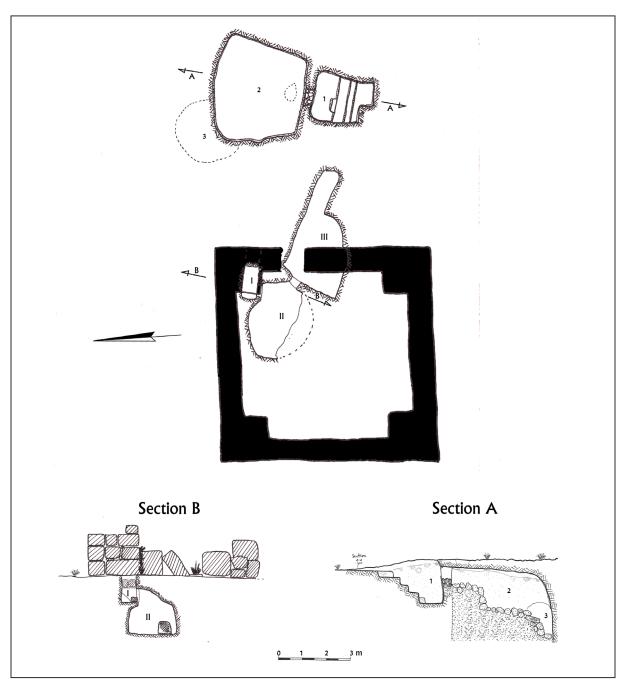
Plan and cross-section of the fortress, storage system, and ritual bath (drawing: Boaz Zissu and Eitan Klein)
